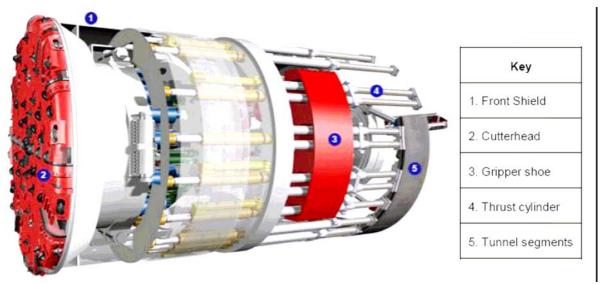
Typical tunnel-boring machine (TBM)⁹
